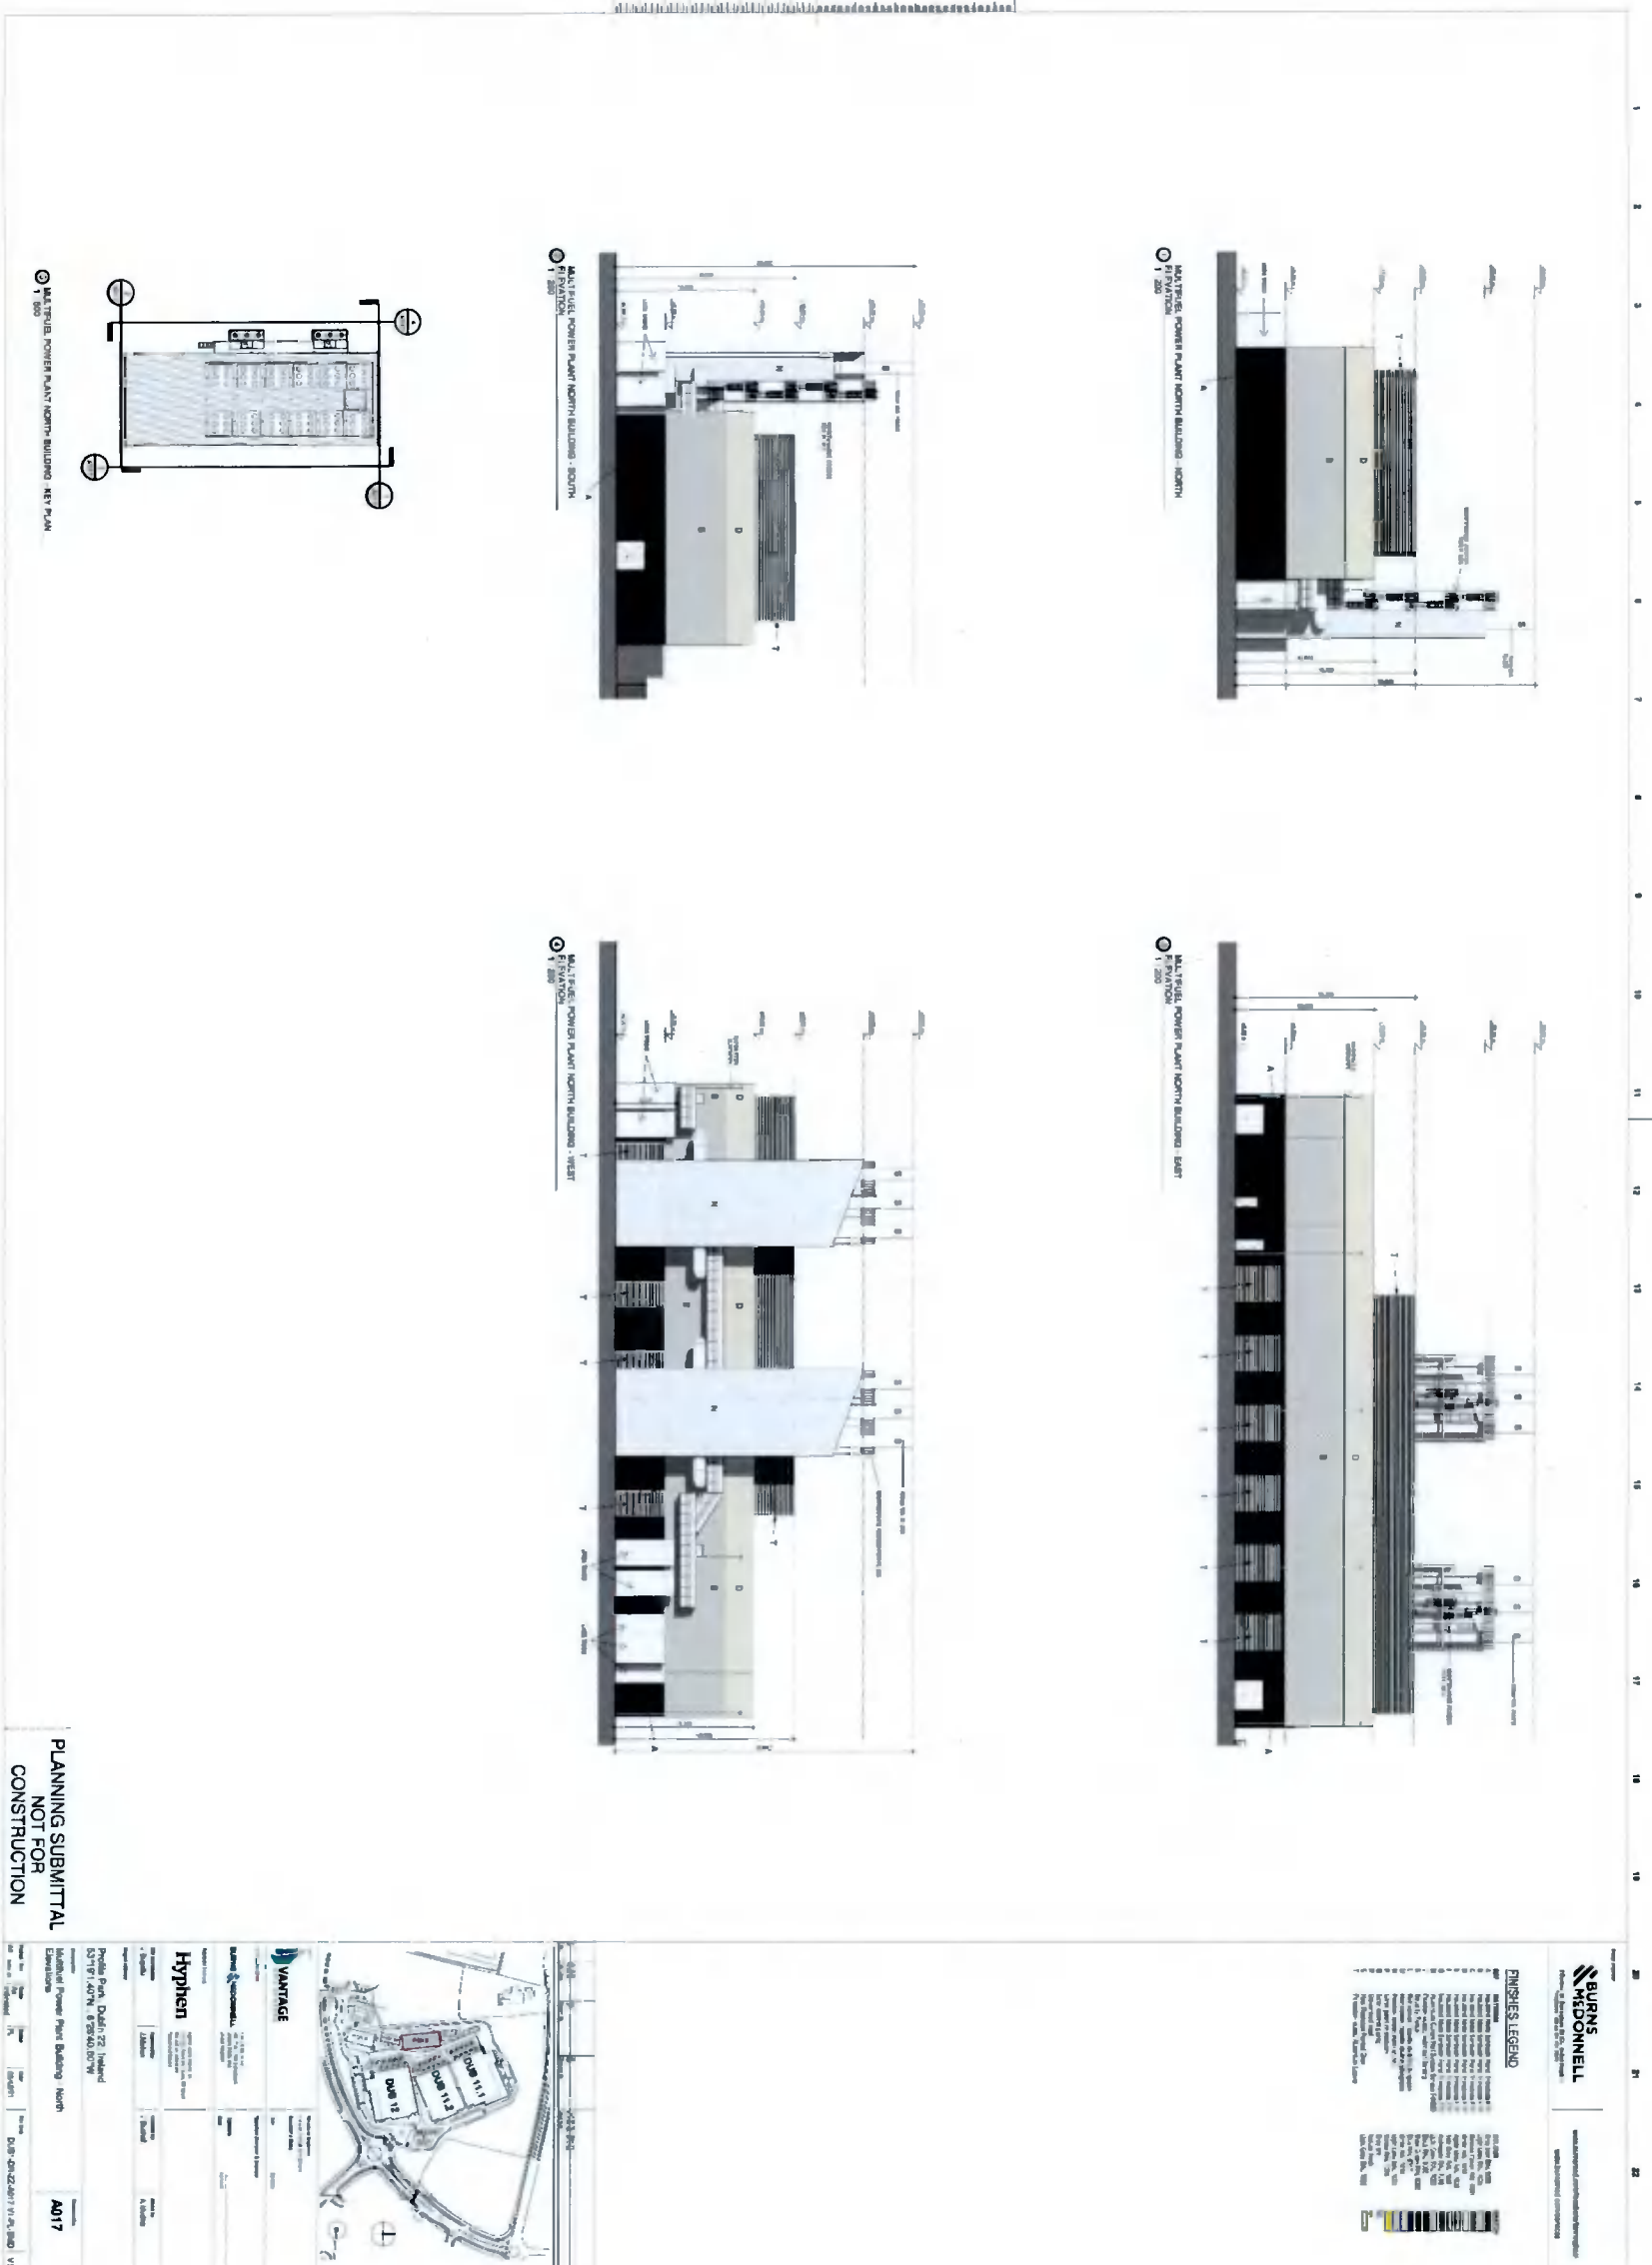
MFGP North Building Elevations (Source Burns & McDonnell)
